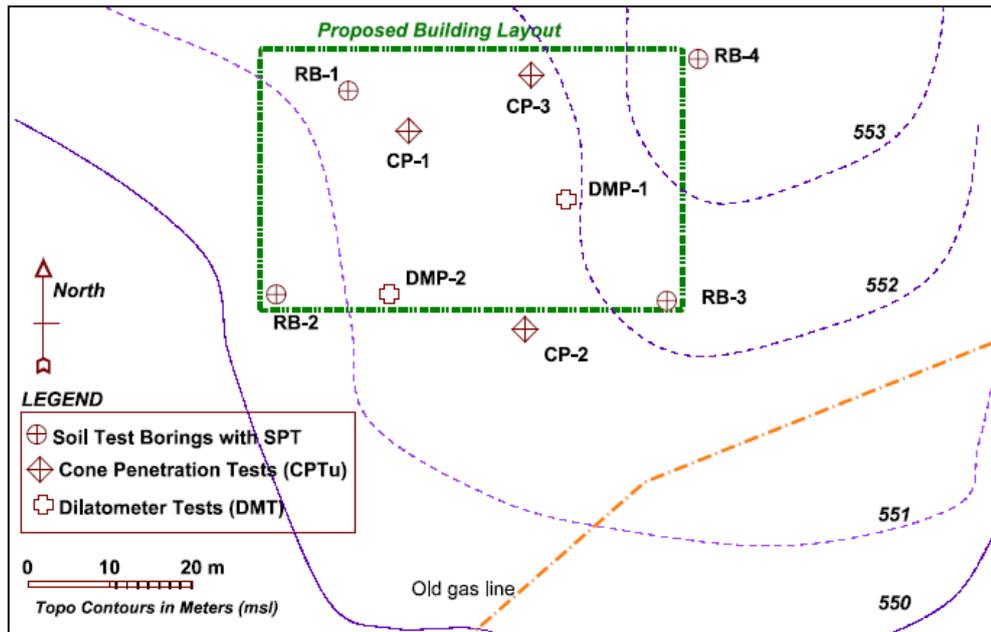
Plan showing proposed boring and in-situ test locations (Mayne et al., 2001).
